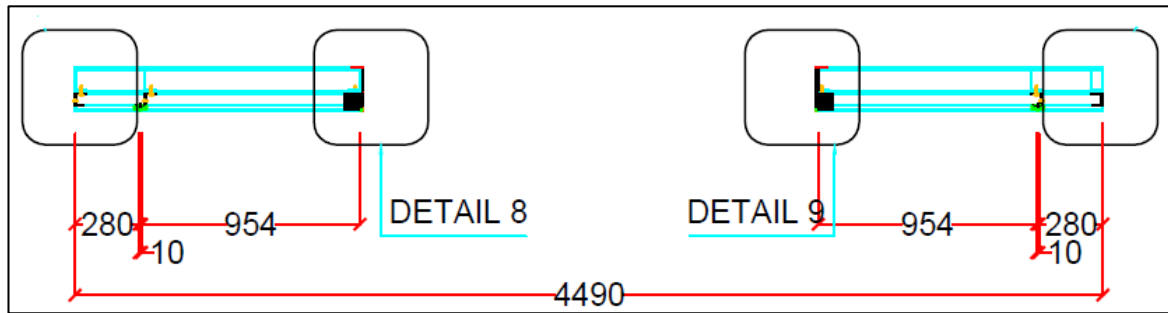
Elevation of the cavity fire barriers and insulation mineral wool slabs fixed onto the base wall.
